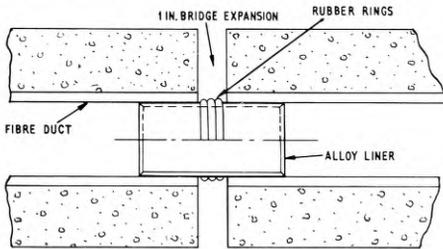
METHOD OF PROVIDING AN EXPANSION JOINT WHERE FIBRE DUCTS ARE USED
